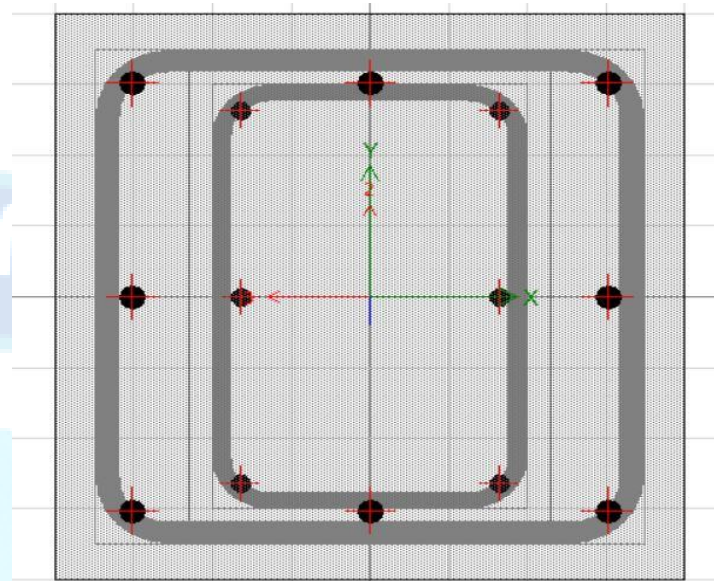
Beam Steel Retrofitting Size – 230 mm x 350 mm
